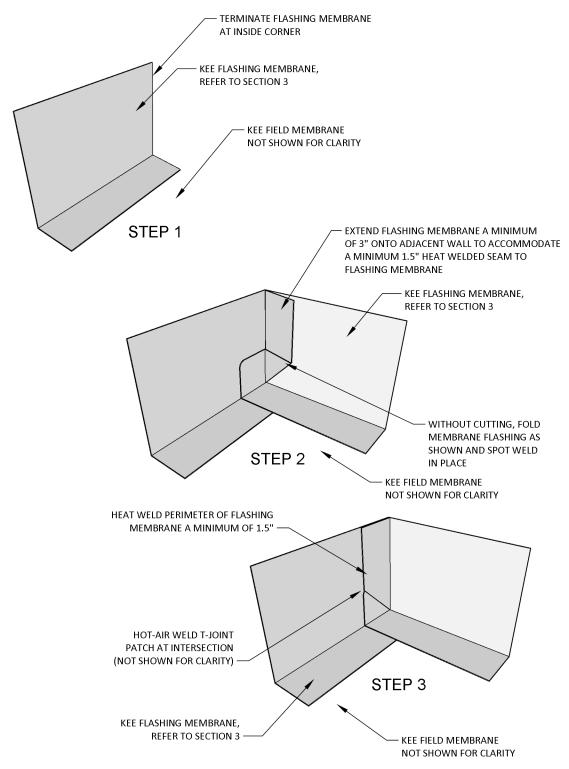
Induction Welded KEE Field Membrane with Field Fabricated Flashing at Inside Corner
